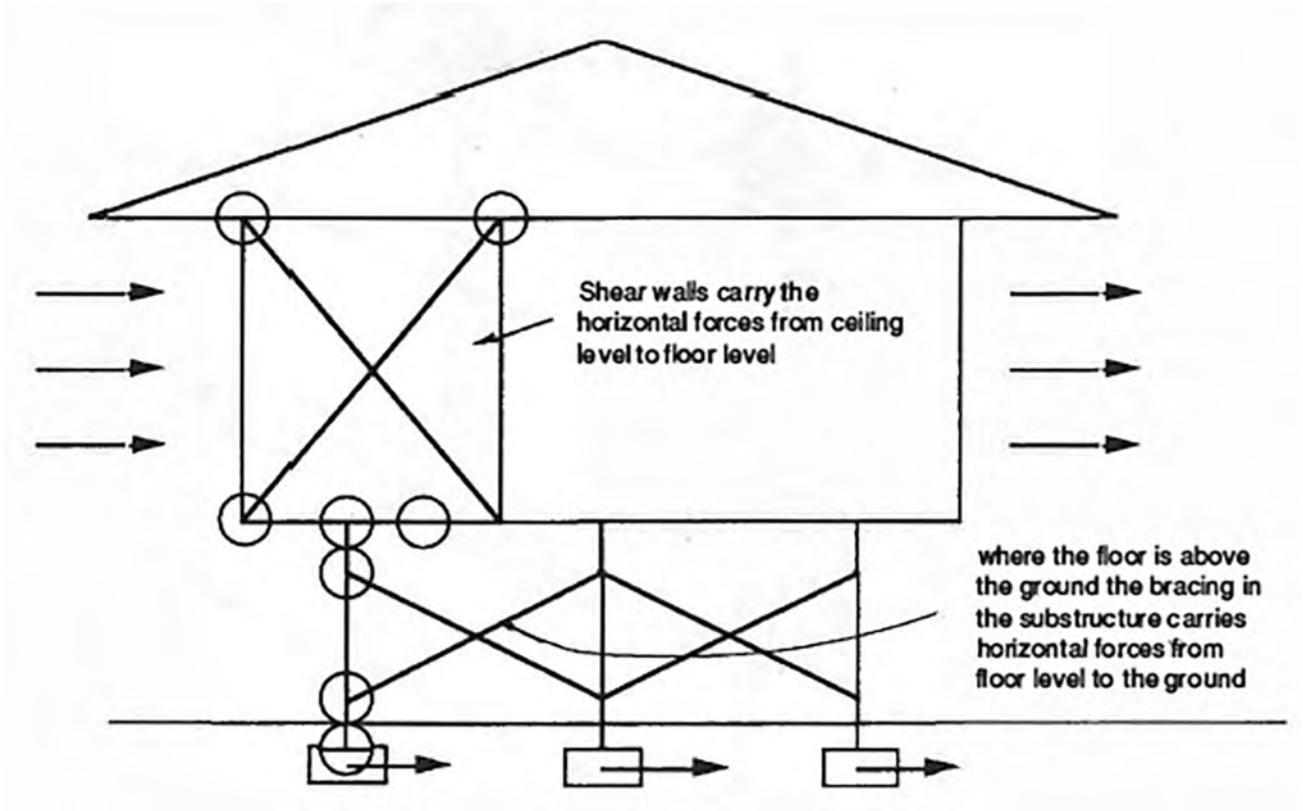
BRACE WALLS AND SUB-FLOOR TO AVOID FAILURE DUE TO HORIZONTAL FORCES
